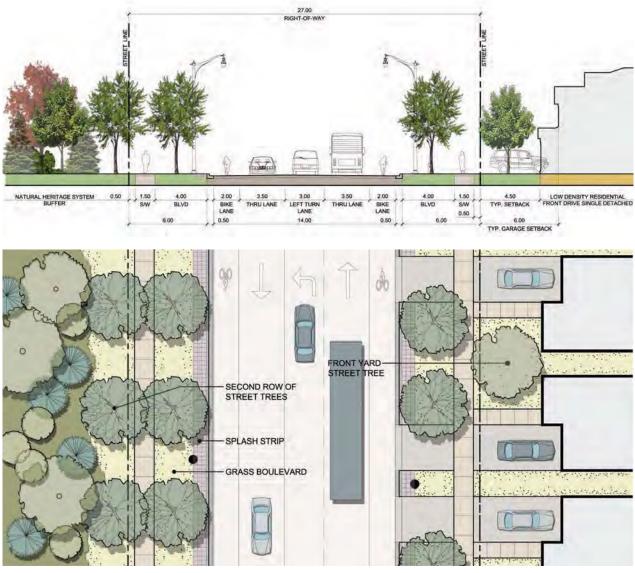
Section A2-A2: Conceptual Spine Road treatment west of Collector Road D (27.0m ROW) with 2 thru lanes, left turn lane, on-street bike lanes, and street trees in grass boulevard adjacent to NHS lands and front driveway single-detached dwellings (looking west).
